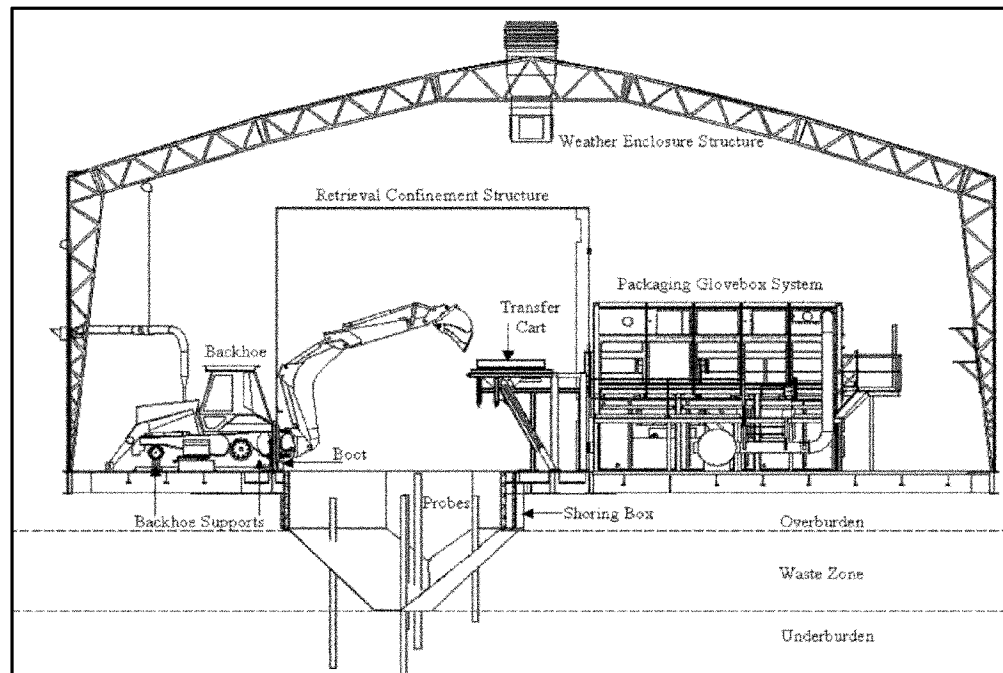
Cross section of the Glovebox Excavator Method Project facility.
